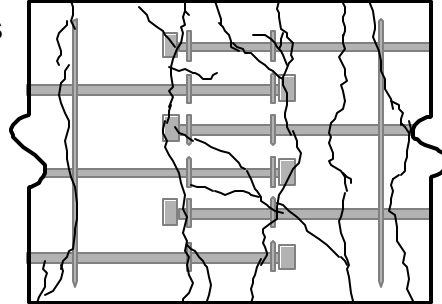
Crack development in a typical hairpin confined lap splice test (specimen LS-08-04.04-12-10(N)-1-H0.6)
